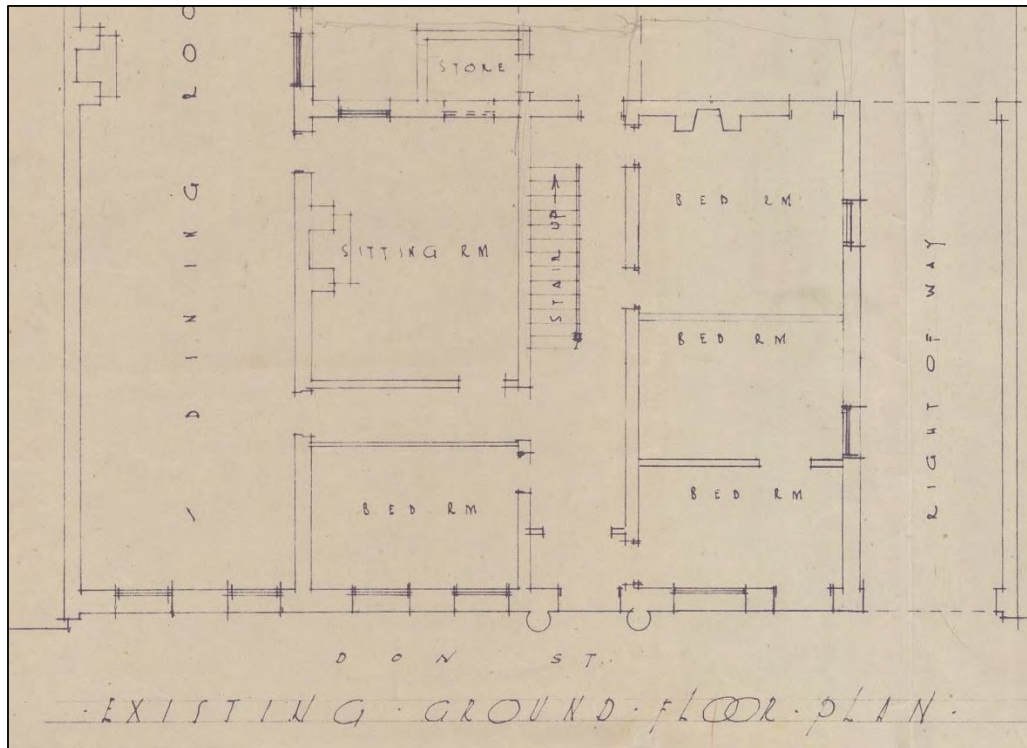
Plan of existing ground floor as it was in 1949 cropped from the 1949 plans for Alterations to Criterion Hotel, Don Street, Invercargill for G. F. Pollock by A. G. A. Milne, architect (ICC Property File).
